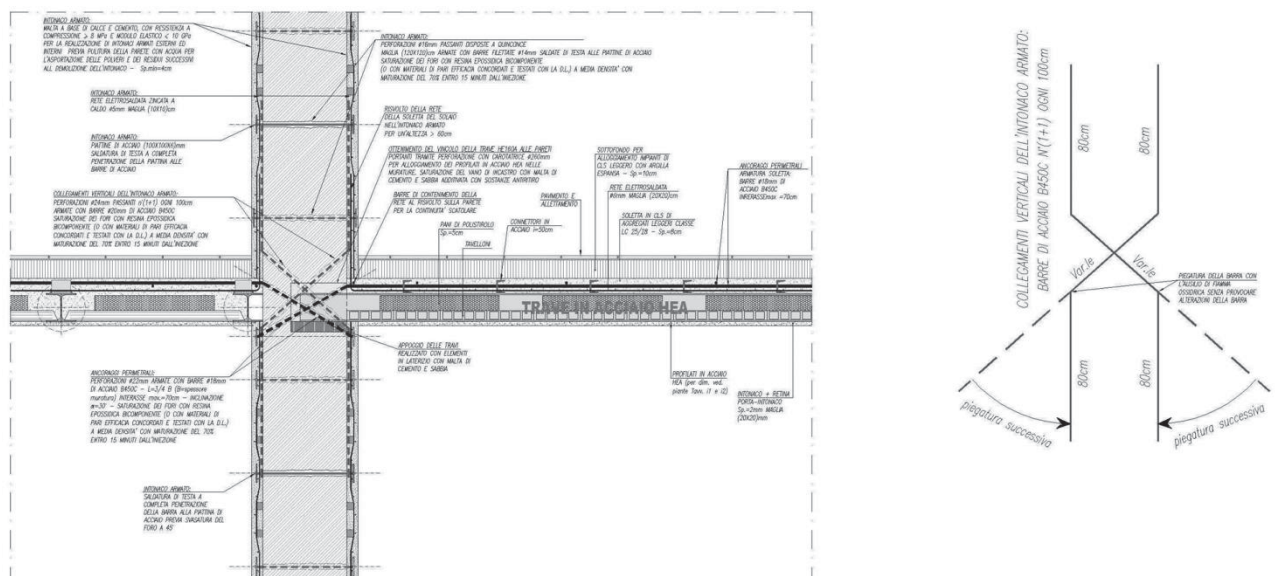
Vertical connection between reinforced mortar and internal masonry pier in correspondence of a steel slab (original drawings by Massimo Mariani)
